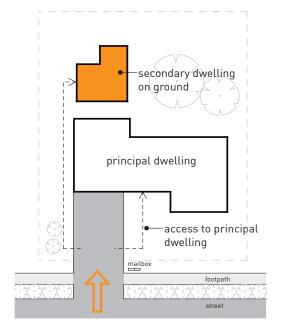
F.2-1: Detached secondary dwelling within the principal dwelling site.
